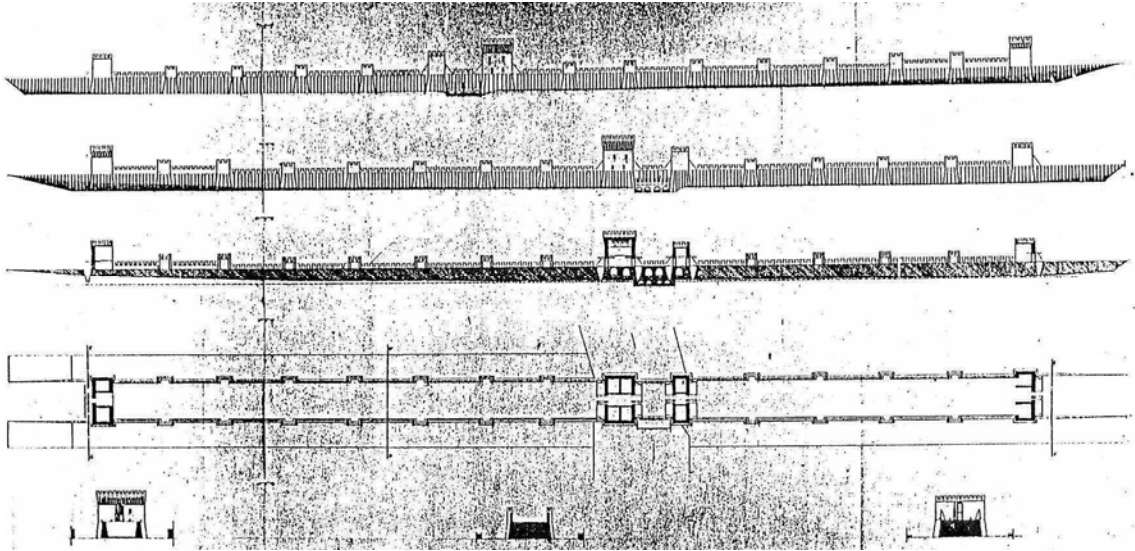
Hypotetical reconstruction of medieval setting up bridge
